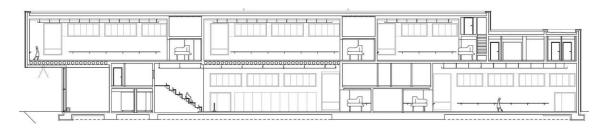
, Section showing flexible ballet room below and rehearsal spaces above. gmp Architekten
